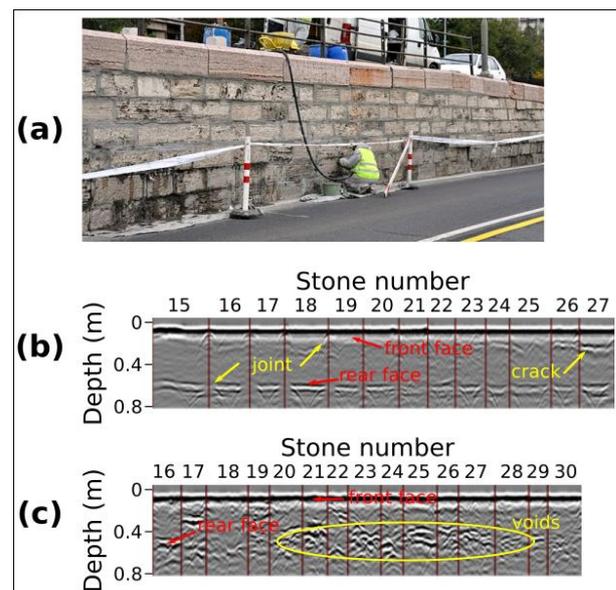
Examples for the GPR inspection of a gravity retaining wall in Budapest: (a) front face of the inspected stone masonry wall, (b) GPR image of a rather intact section with only a few cracks, but with no voids; (c) GPR image of another section with significant voids inside the wall and in the backfill as well.
